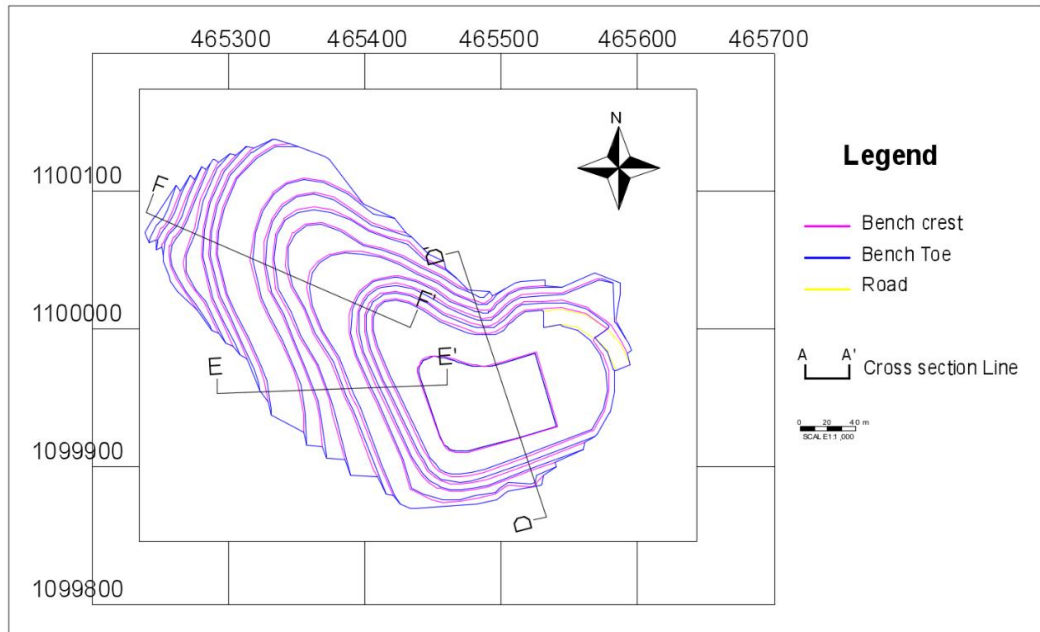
30 Pit MF-10 after mining by Pit design Ver.2 and its cross-section line
